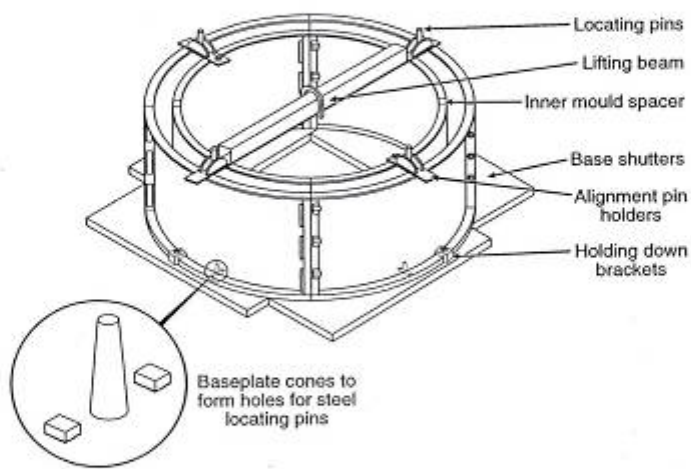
Formwork for pre-cast concrete well rings (adapted from Oxfam)
